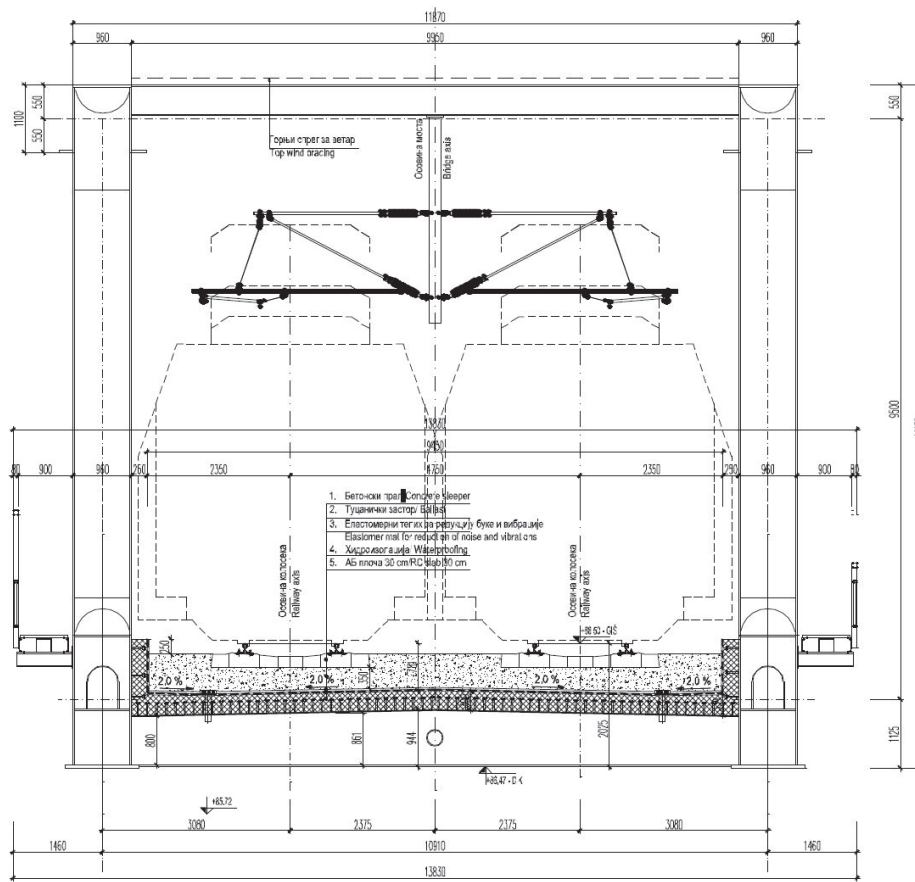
Bridge at km 0+796 – Typical cross section in span 2
